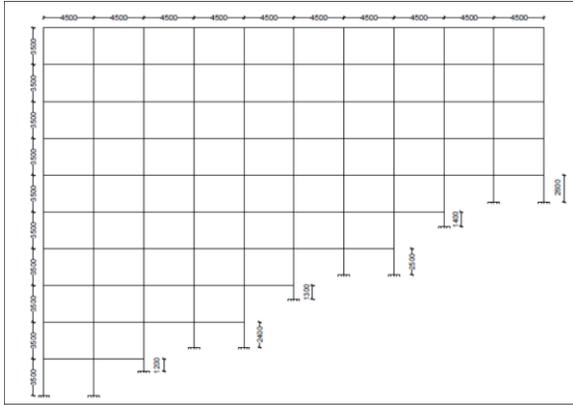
Elevation of model M-1.(Note: All dimensions in mm)
